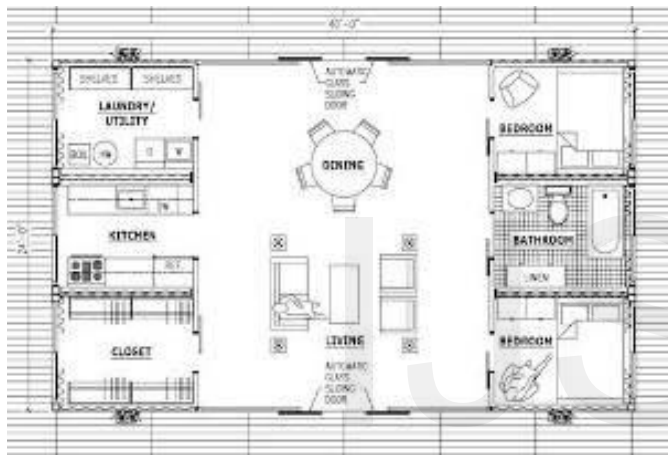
floor plan showing how it looks like if 3 containers are opened between each other.
